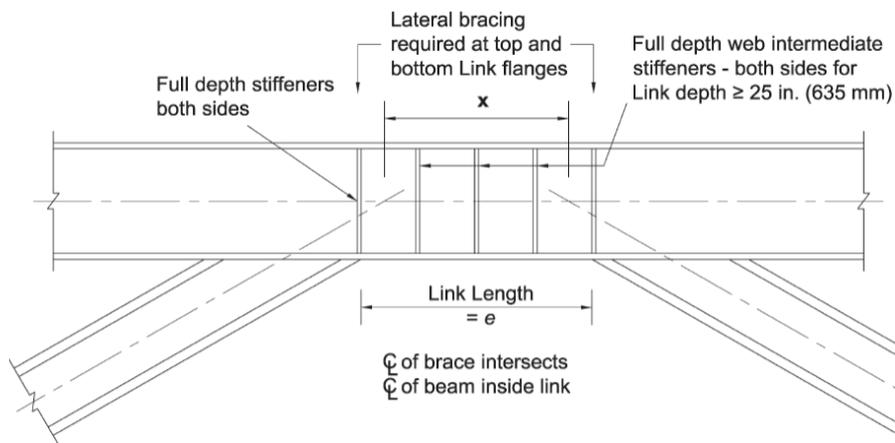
Eccentric Braced Frame with W-shape Bracing, from ANSI/AISC 34, 2010
